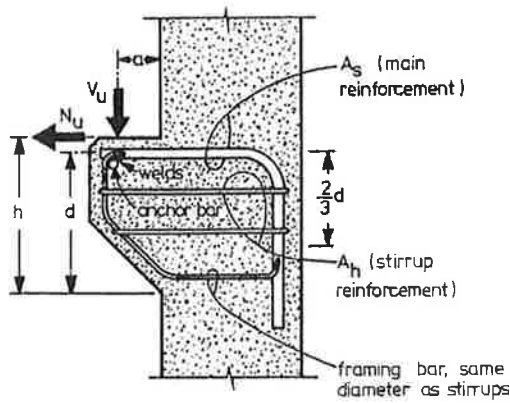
TYPICAL CORBEL REINFORCEMENT
